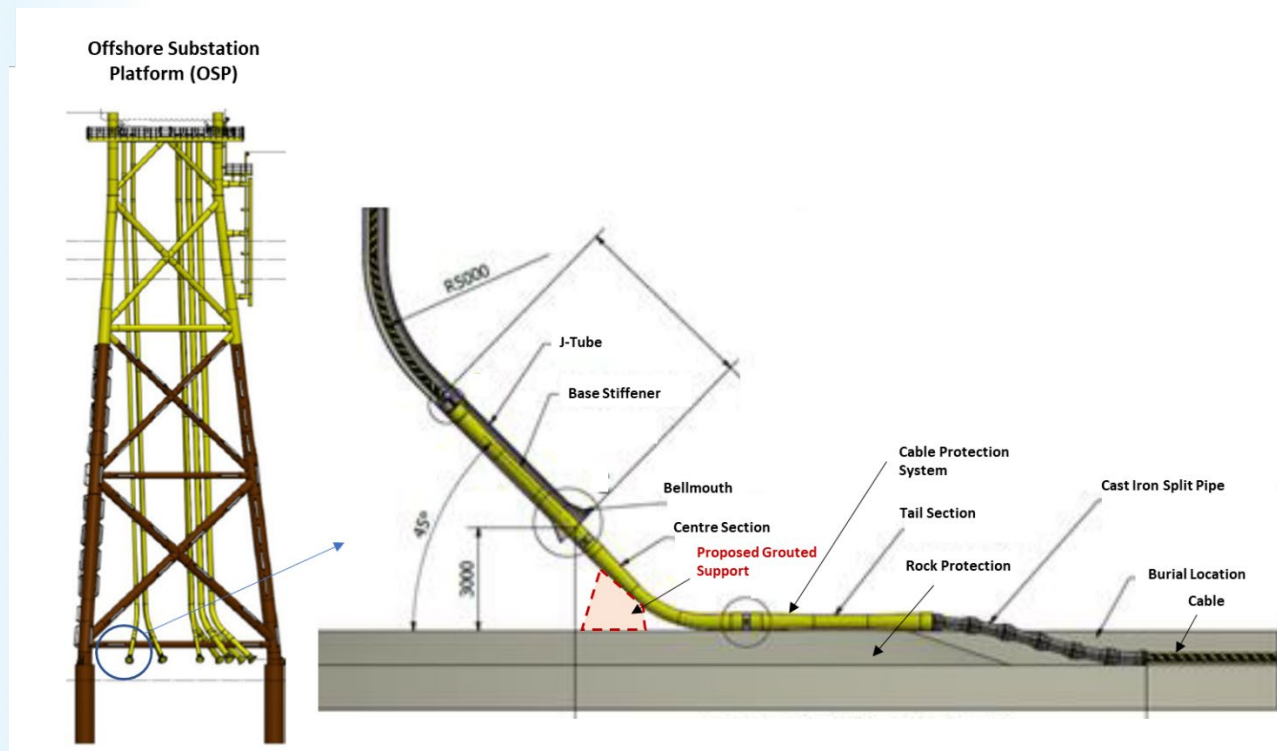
Indicative overall layout - Cable Protection System and Proposed Grout Support
